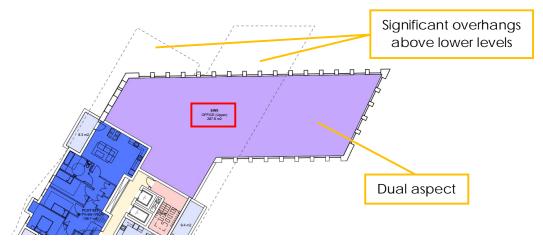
Plan view of the upper ground level of Distel Apartments (office use)
